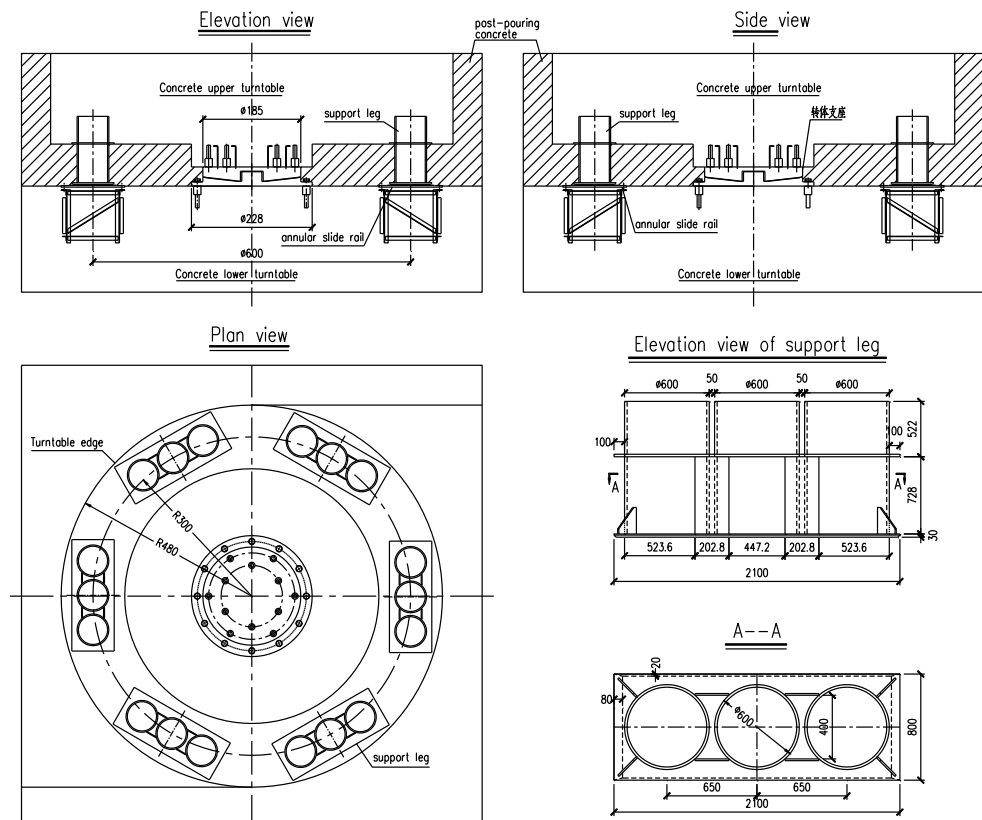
Swivel structure and support leg structure diagram (Unit: mm)
